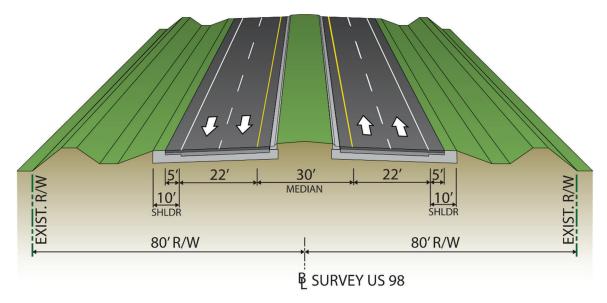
Proposed US 98 C2 (Rural) Typical Section
